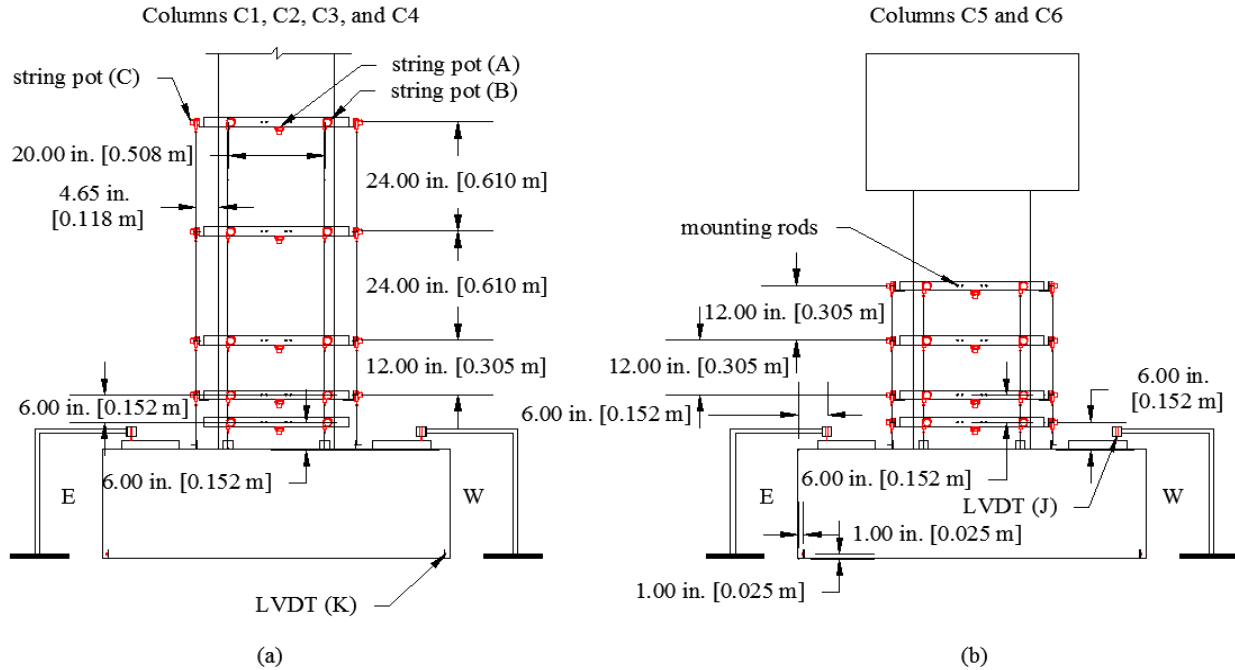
North elevation view of external instrumentation for (a) columns C1 through C4 and (b) columns C5 and C6
